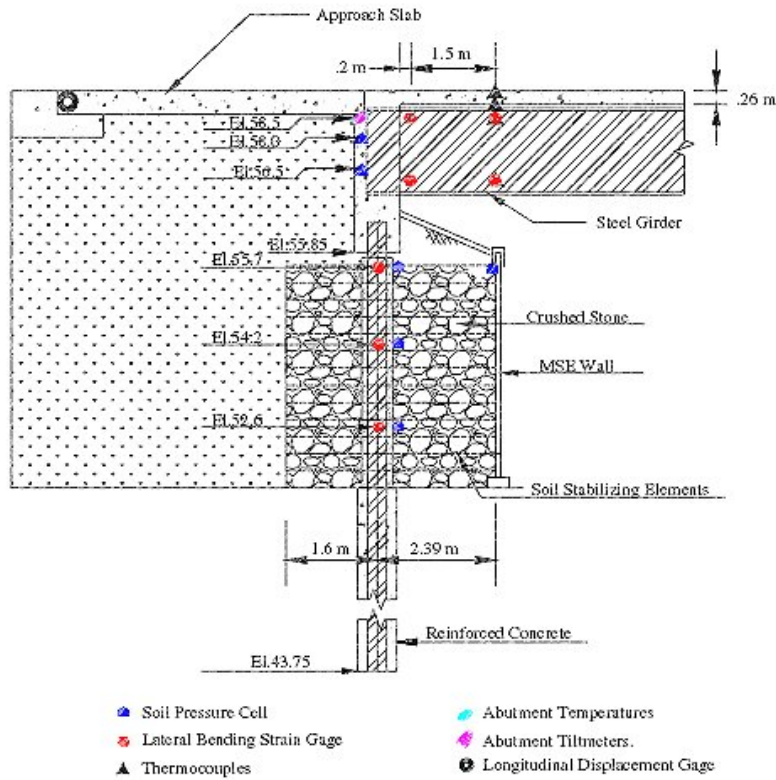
An instrumentation drawing-in section of Scotch Road Bridge [76].
